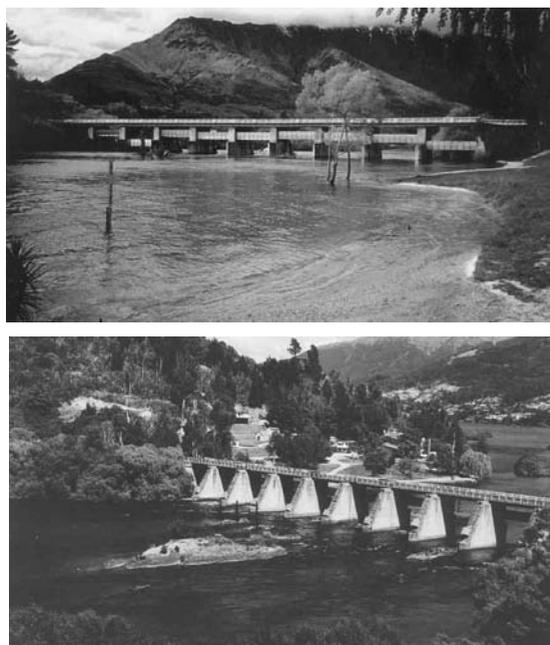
Views of the Lake Wakatipu outlet weir at Kawarau Falls looking (a) downstream and (b) upstream towards the structure.
